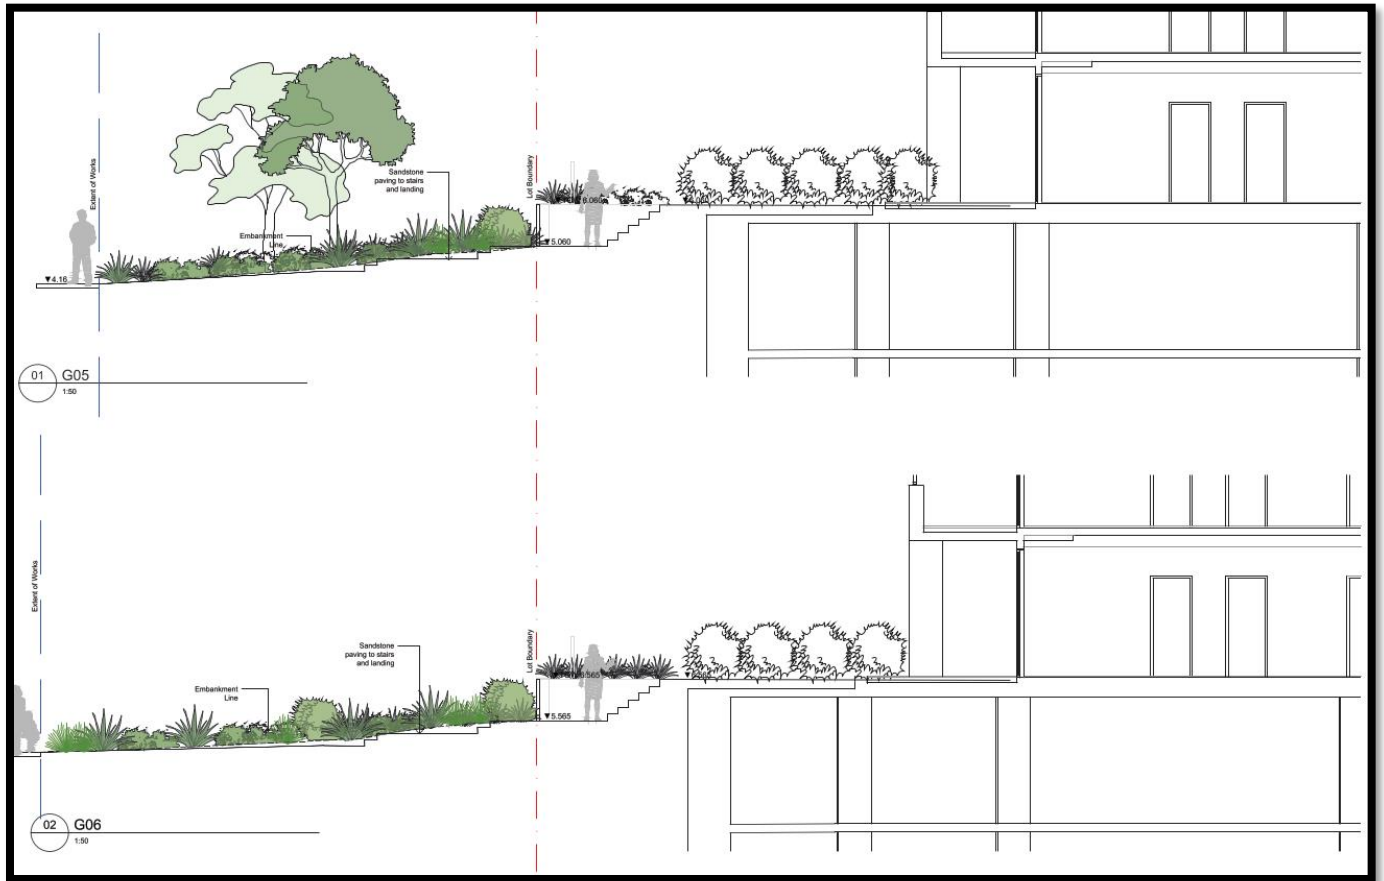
Section detailing pedestrian access to apartments 5 and 6 from public foreshore
